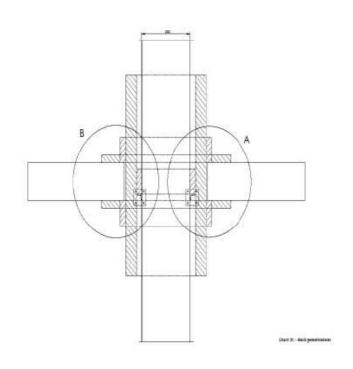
On the long side of the duct an angular section of $25 \times 25 \times 4$ mm is mounted, which is attached to the duct to secure it in the penetration hole. Self-tapping Ø3,2 x 20 mm screws for every 240 mm shall be used for the mounting. There is welded a 4 mm plate 65×65 mm with four holes on both ends of the welded angle. These are fastened with two Ø76 x 100 mm screws, in each plate onto the deckplate. The joint between the fire protection and the sides in the deck, shall be filled with ceramic fiber, as Fire Master 607, with a density of min. 96 kg/m^3 . The width of the joint shall be between 10-20 mm. A FireFree ScandiBoard 850, 30×100 mm is mounted on the plate around the the duct, attached with Ø5 x 80 mm screws, with a distance of 250 mm between. Hereafter a FireFree ScandiBoard 850, 30×100 mm is fastened to the deck with Ø5 x 80 mm screws, with a distance of 250 mm between.
